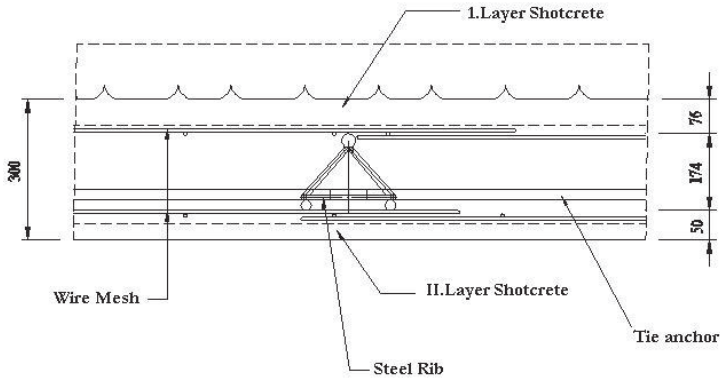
The details of excavation, steel rib, wire mesh and shotcrete.
